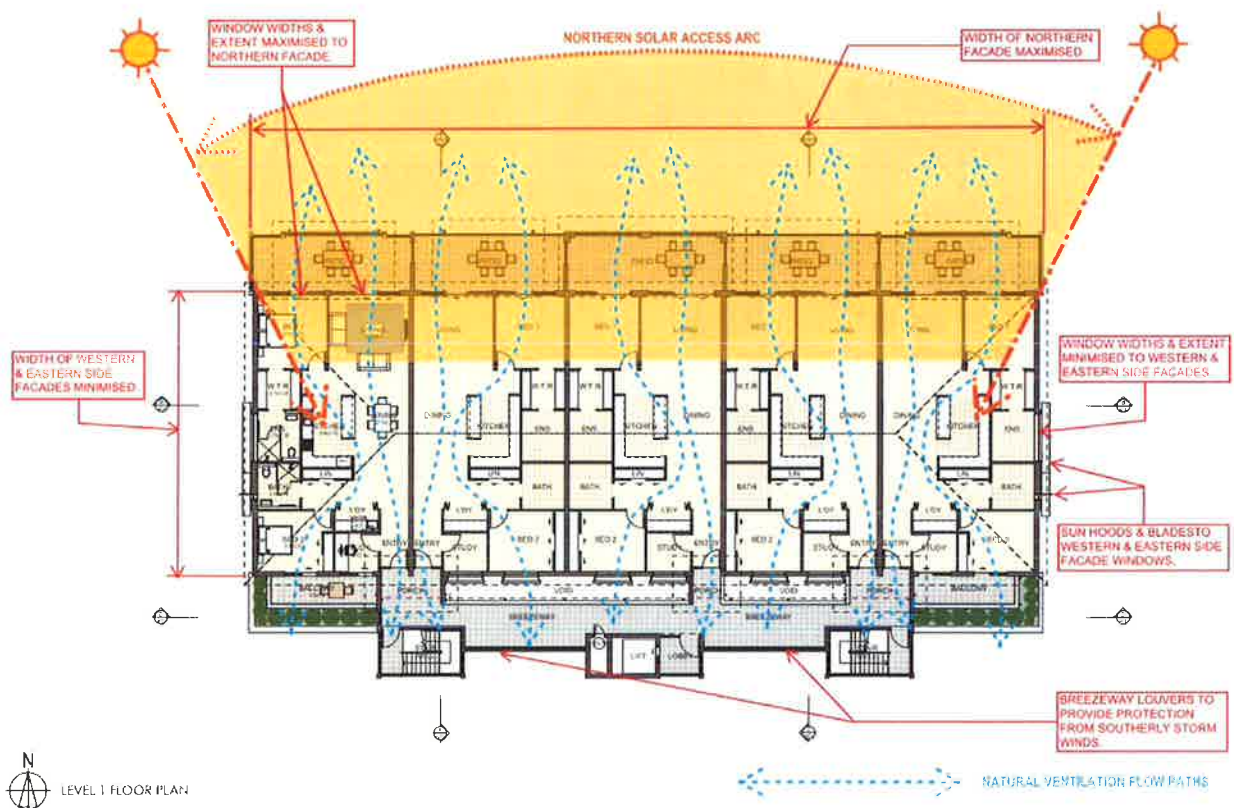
Typical Apartment Block Level 1 Floor Plan
